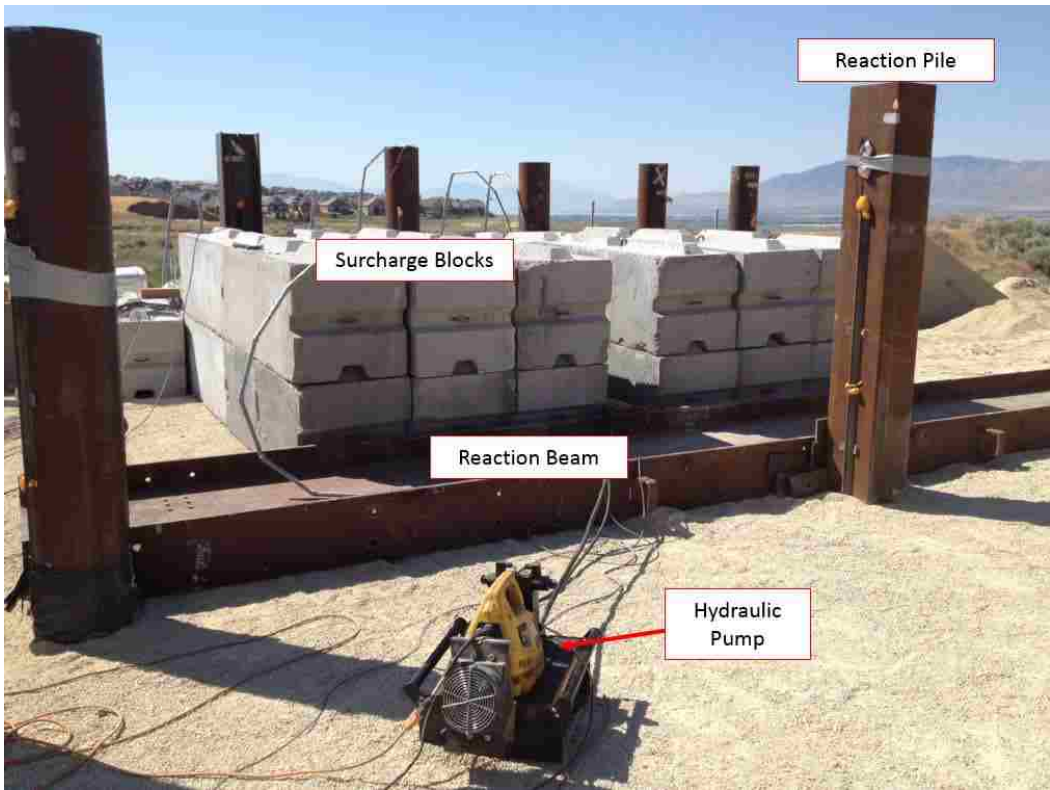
Loading apparatus, reaction beam, and surcharge blocks.
